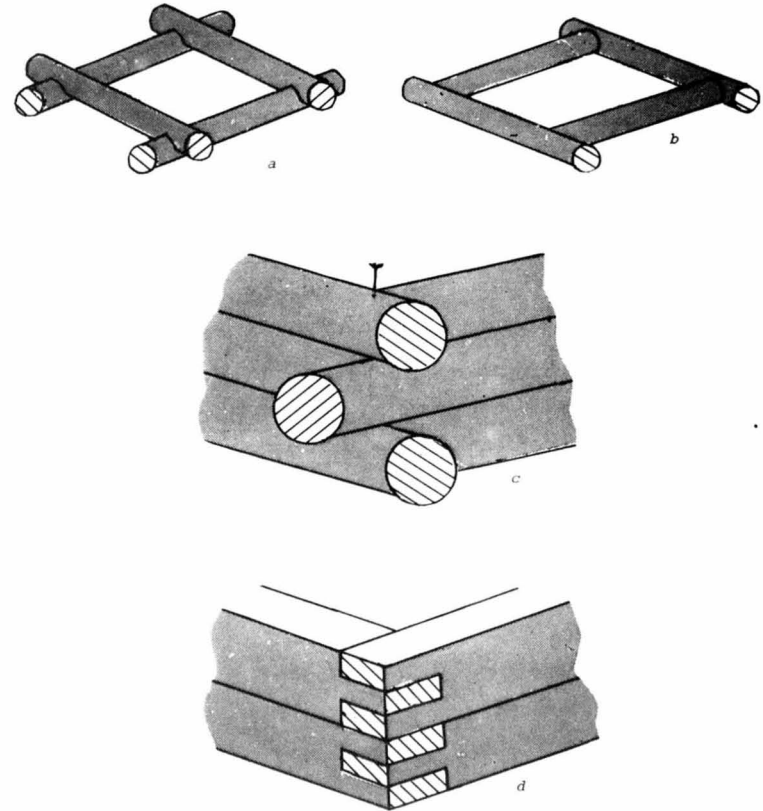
Corner terminology: a, true notching; b, false notching; c, butt joint; and d, lapped or rebated joint.
